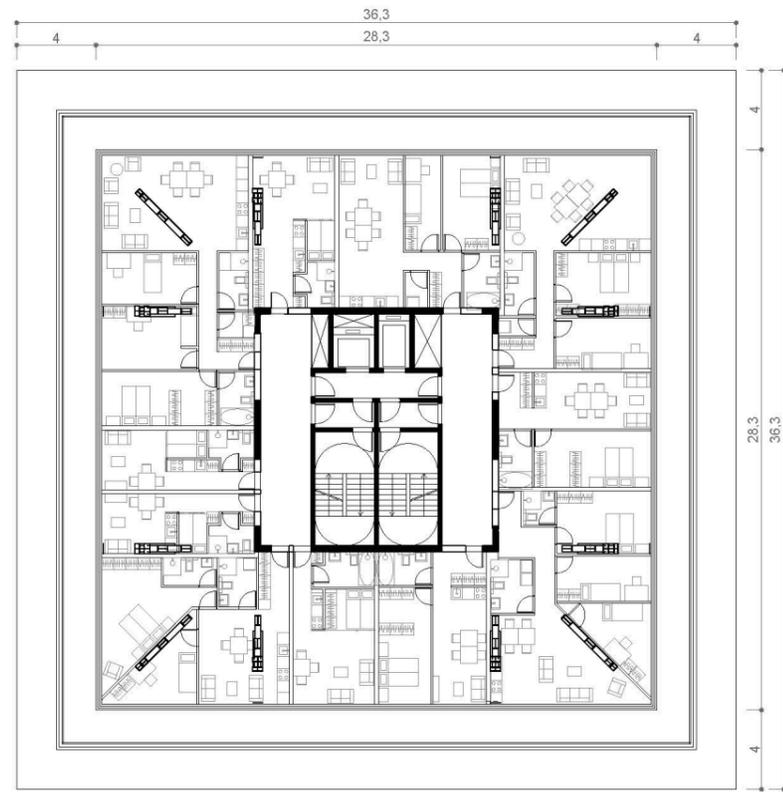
Prototype 2 – Steel Tower typology: Plan type for apartments
